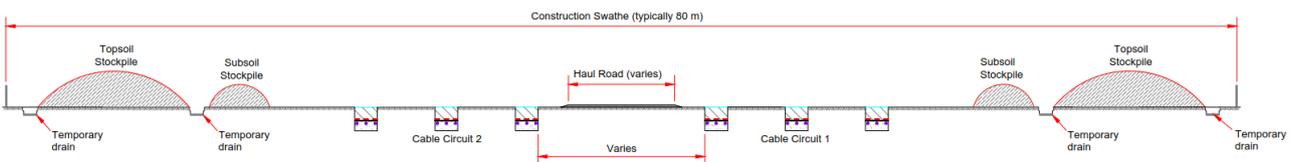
Indicative 2 x 3 GW 380 kV direct buried installation
